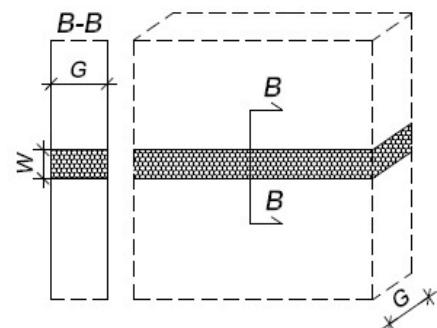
View and cross-section of the horizontal linear joint seal in wall
